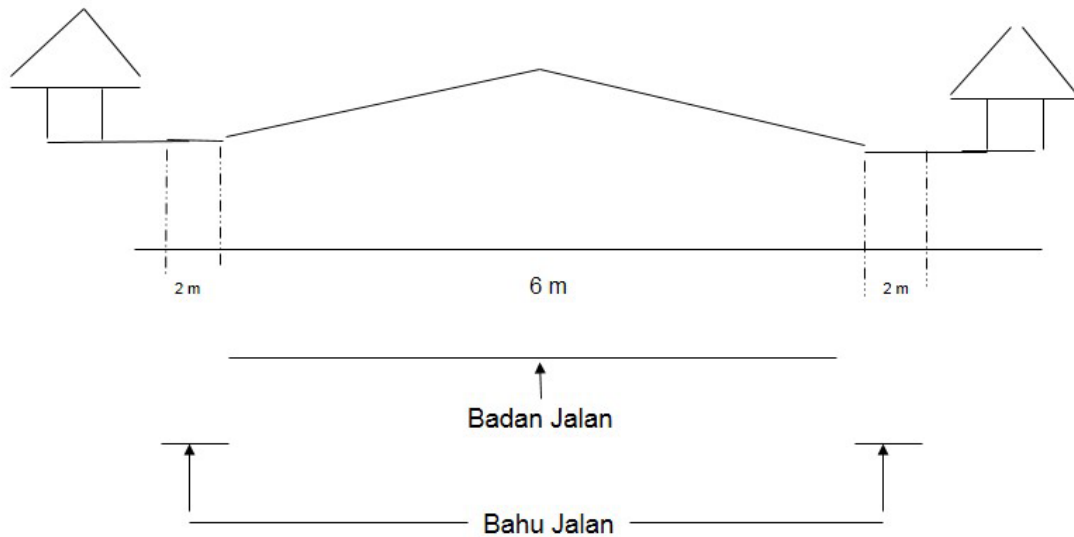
Condition Road in Access Road Plan into Patimban Port (Red Soil)
